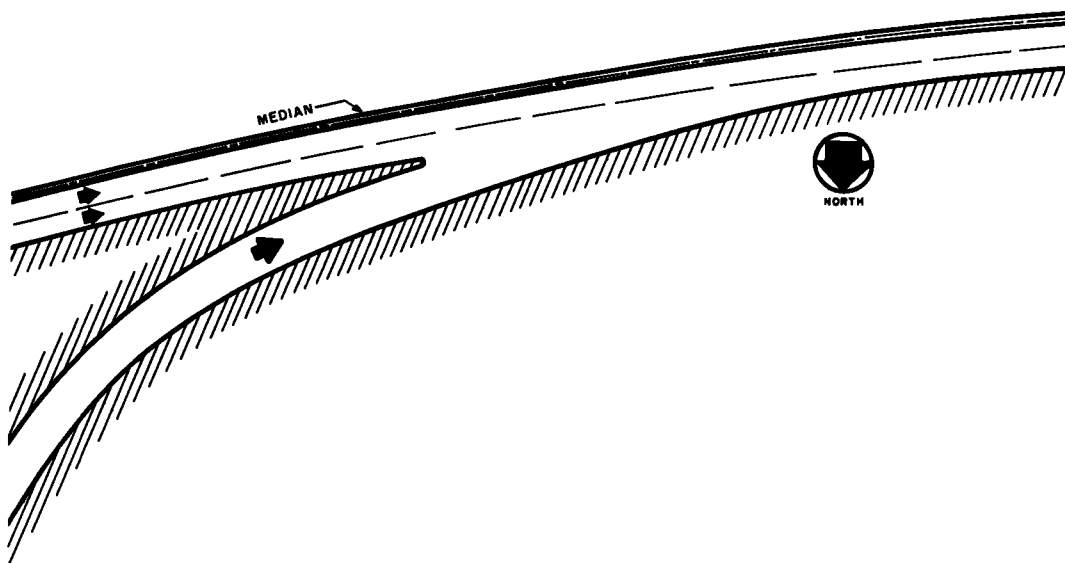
Ramp study section, Ft. Worth East-West Freeway—Study II.
